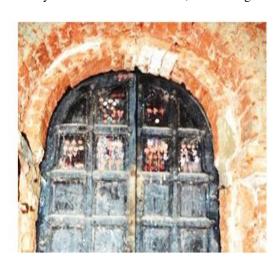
Details Of Brick Arches Acting As A Lintel For Bearing The Load
